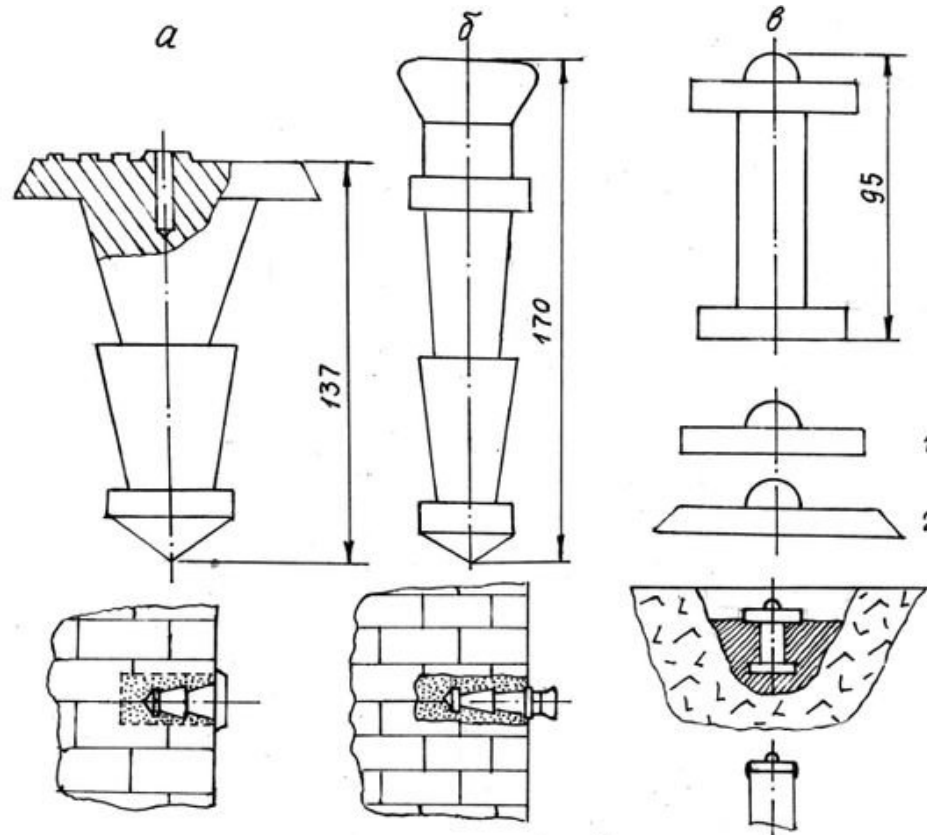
Types of benchmarks of the leveling network: a - wall mark; b - wall benchmark; g - brand for concrete and rock benchmarks; 1 and 2 - grades for installation on tubular benchmarks
